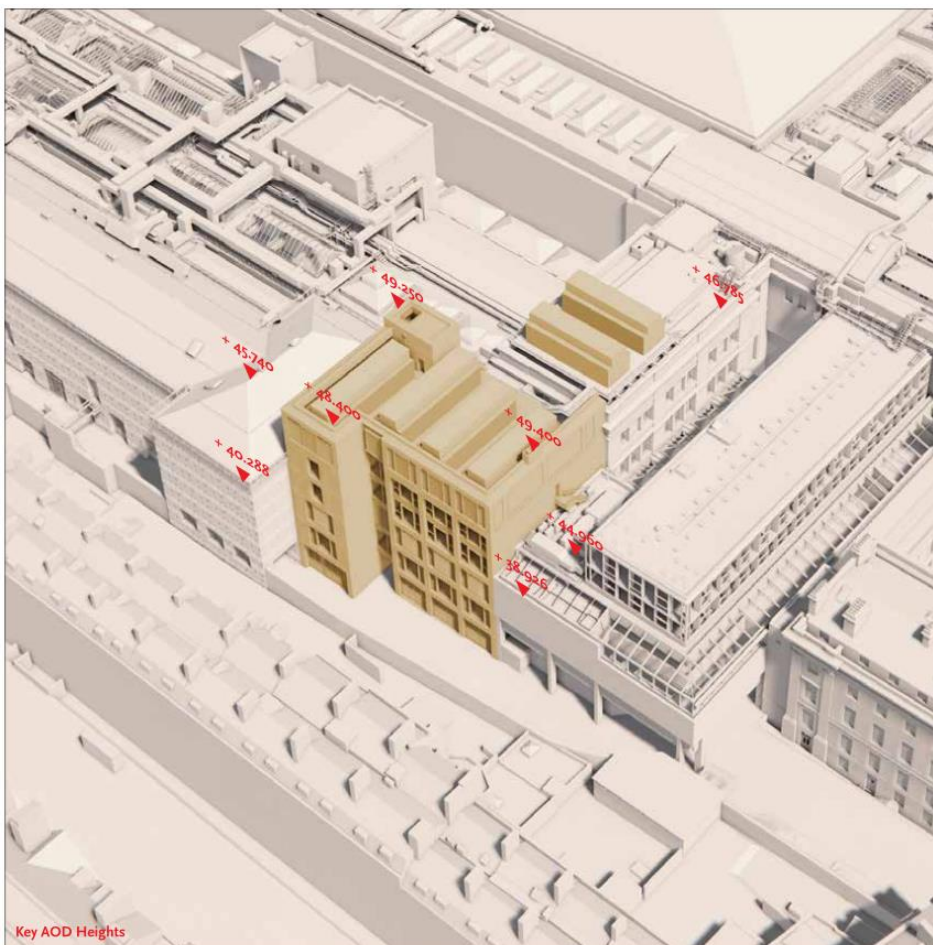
Proposed SWEC massing in context of surrounding buildings (Image from Wright and Wright Stage 3 Report, 2023)
